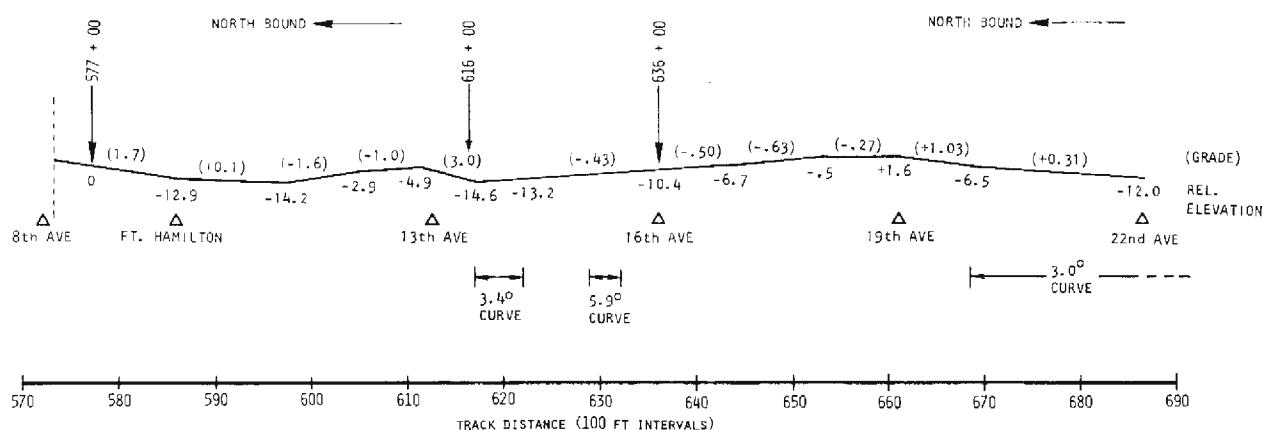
Track Profile (Test Section, Sea Beach Line)
